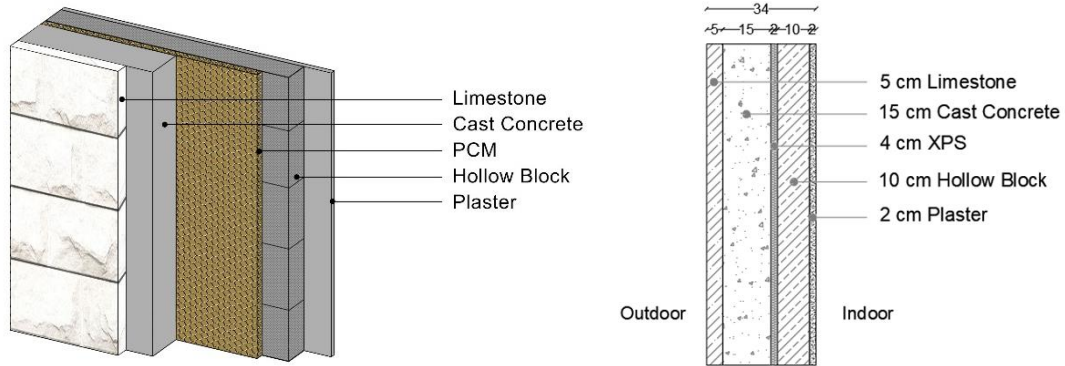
Installation of PCM in the wall section and wall configuration, Researcher.
